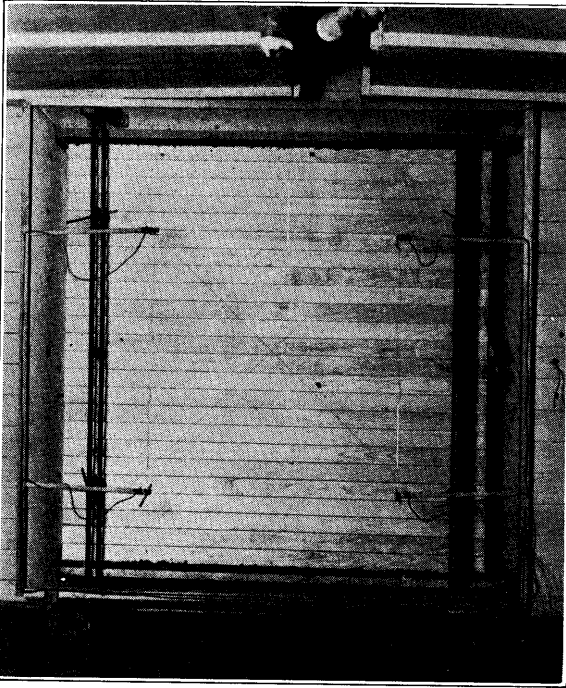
WALL SECTION IN PLACE FOR TEST
